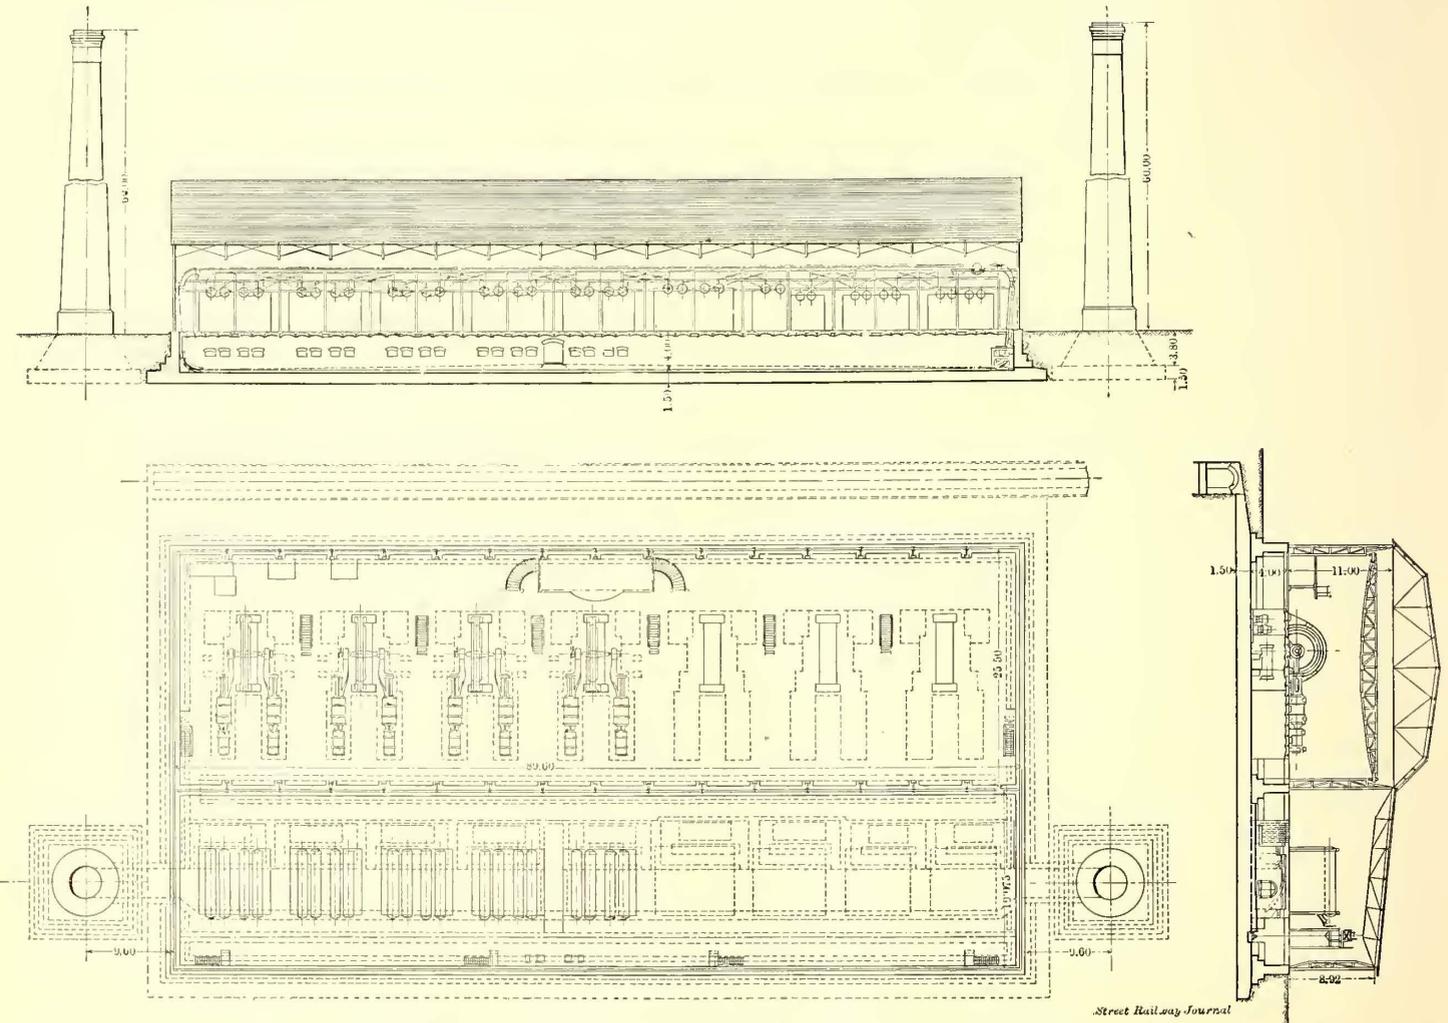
GENERAL PLAN AND ELEVATION OF BRUSSELS POWER STATION
